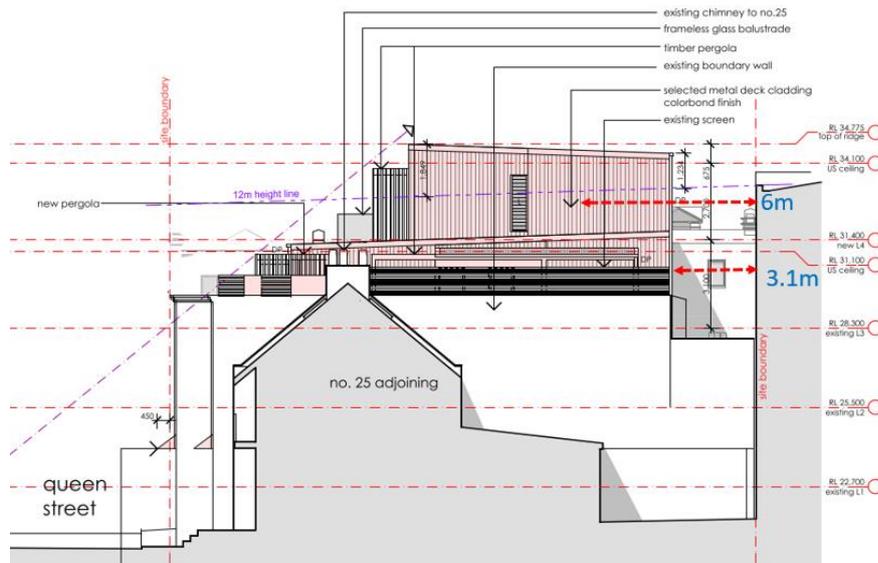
section plan showing 3.1m setback for rear bedroom windows to the southern boundary and a compliant 6m setback as specified by the ADG.
